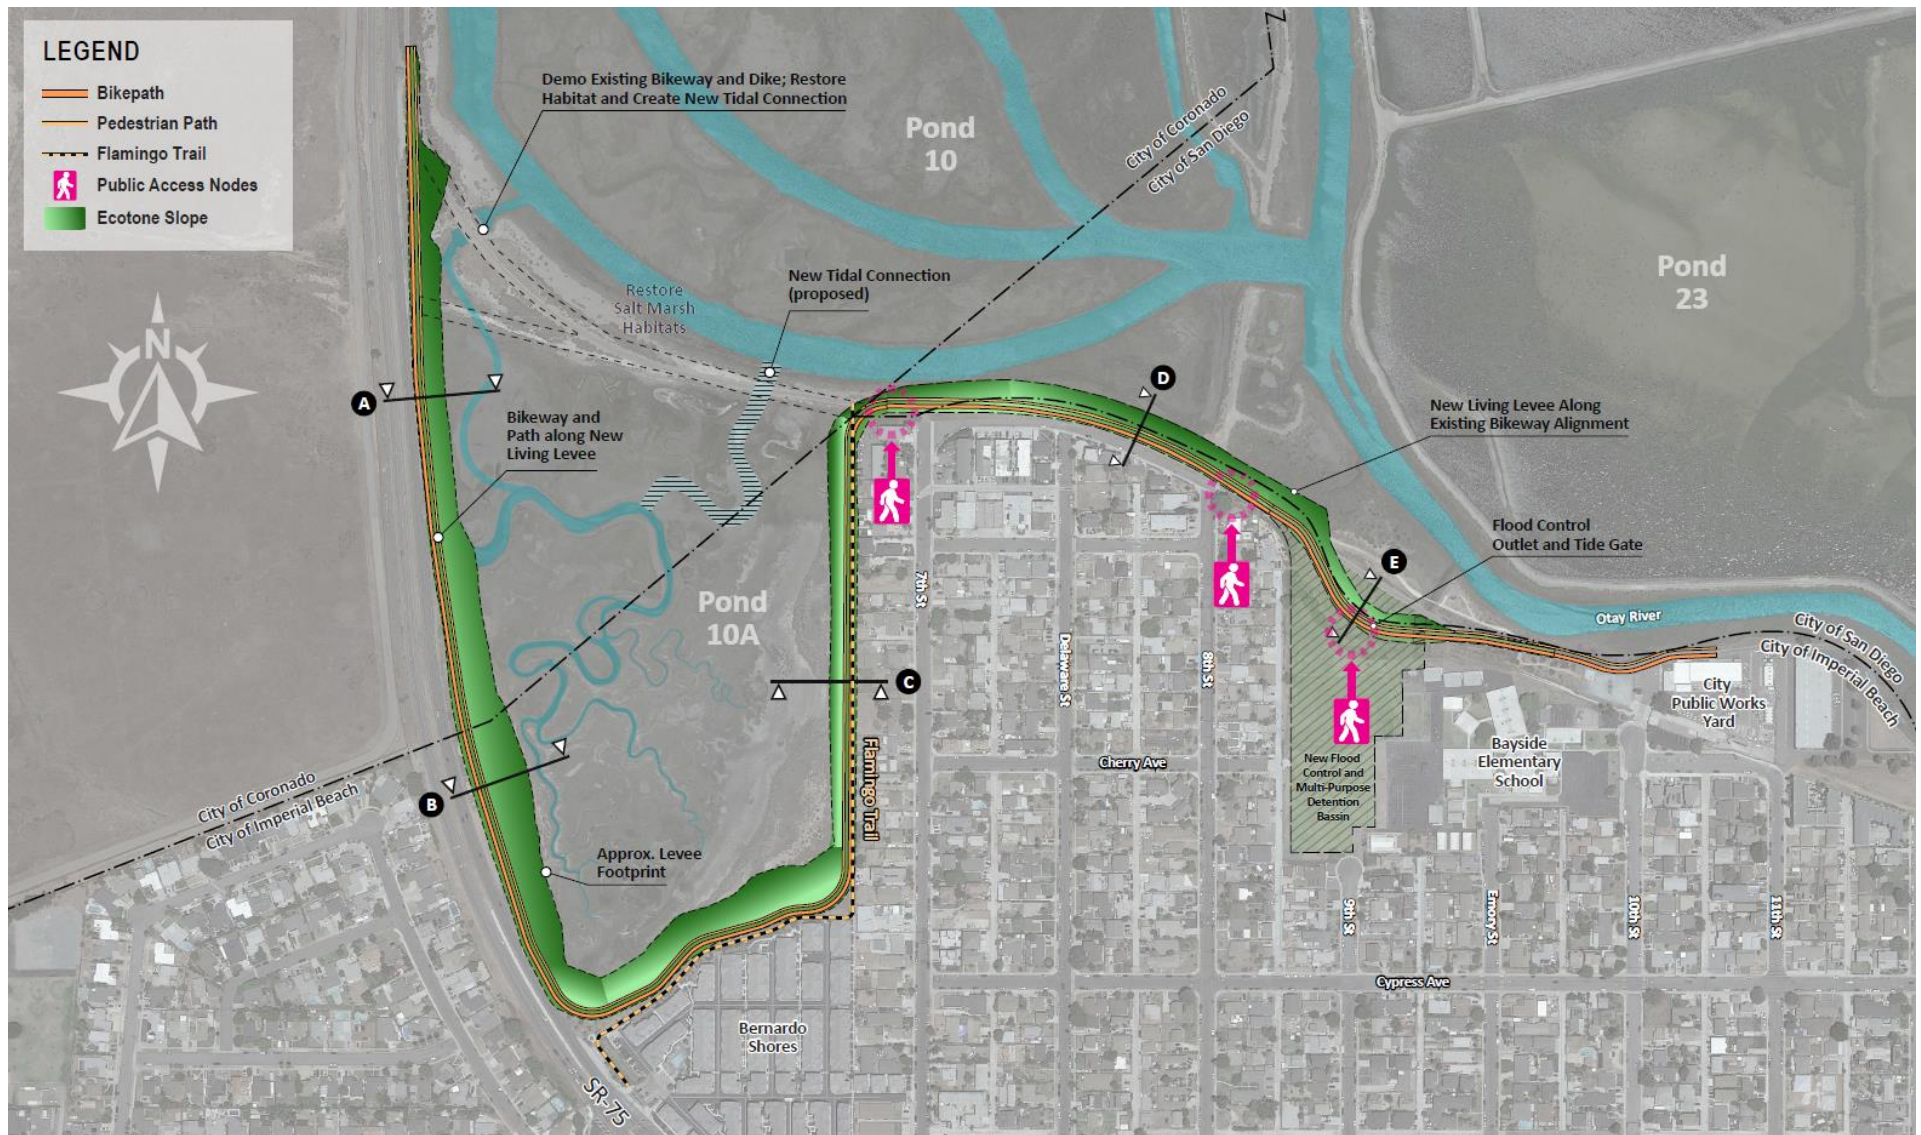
Preferred Alternative (Alternative 3) Plan View
